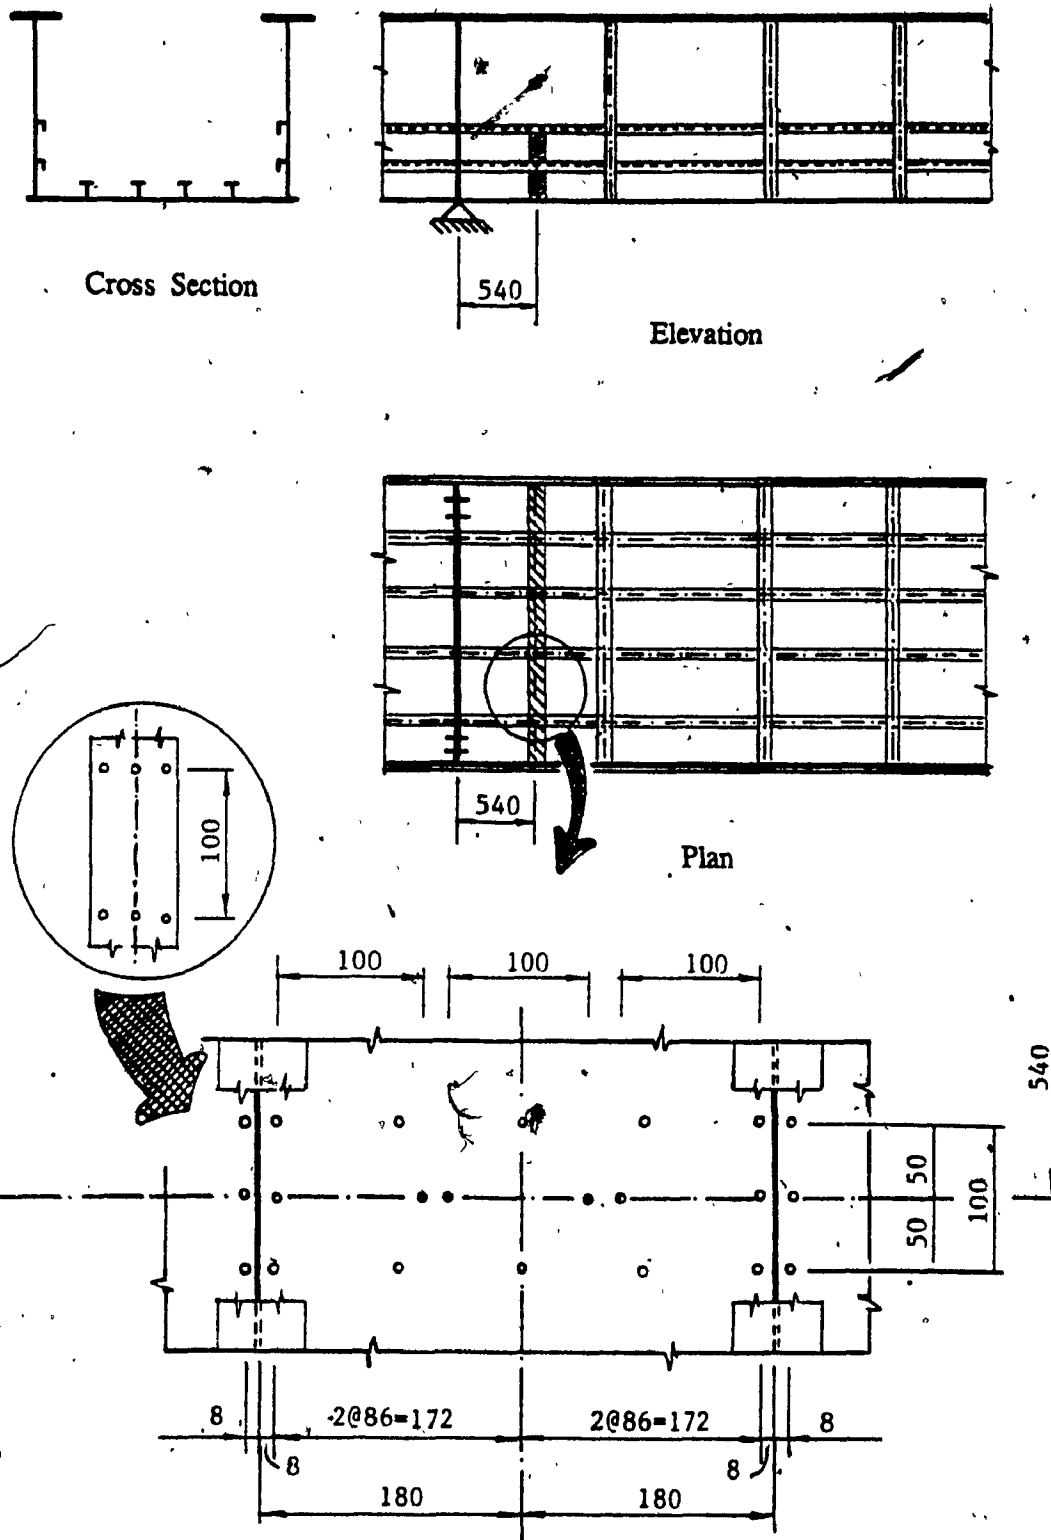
Welding Sequence of Bottom Flange of Box Girder Model
